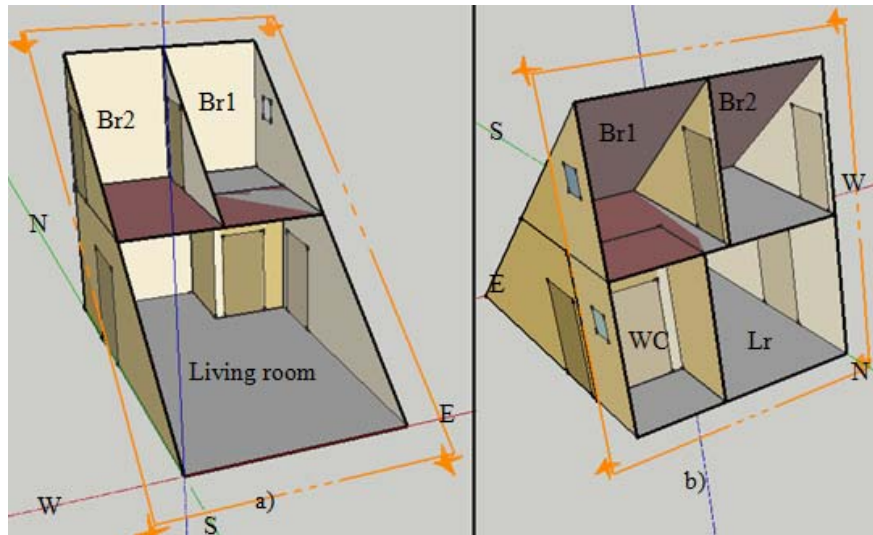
Geometrical definition of the residential house (Br-bedroom, Lr-Living room, WC-Bathroom) (a) South side; (b) North side.
